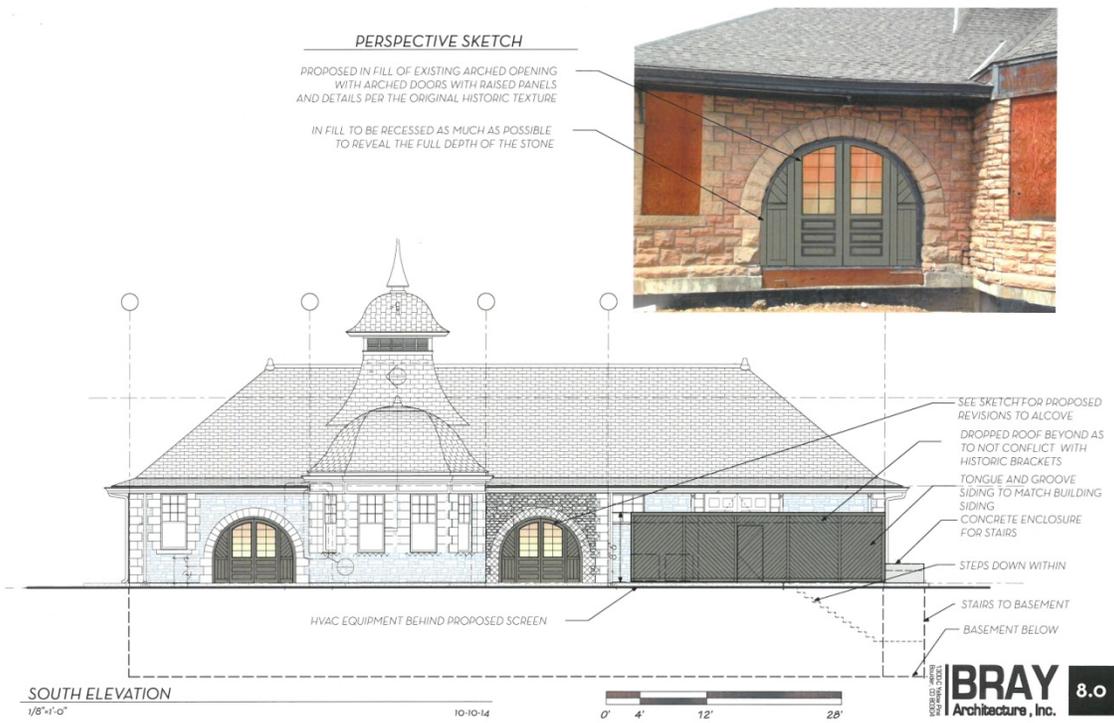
Current proposal South Elevation and Perspective Sketch, 2014.
